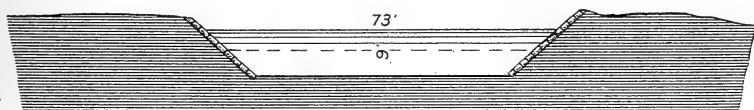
Earth section of improvement of Erie canal suggested by Canal Committee. Width of bottom of canal 49 feet.
